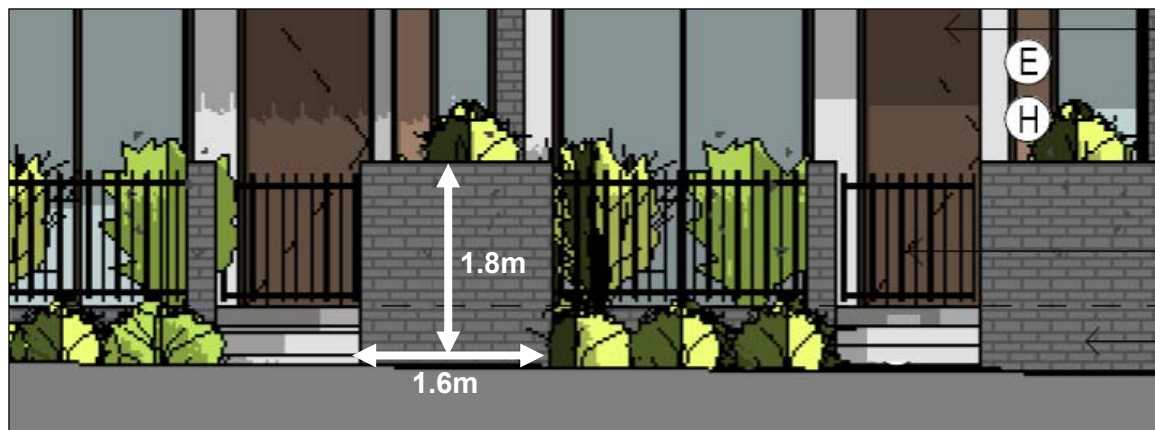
indicative elevational detail – typical front setback elevation to primary roads
